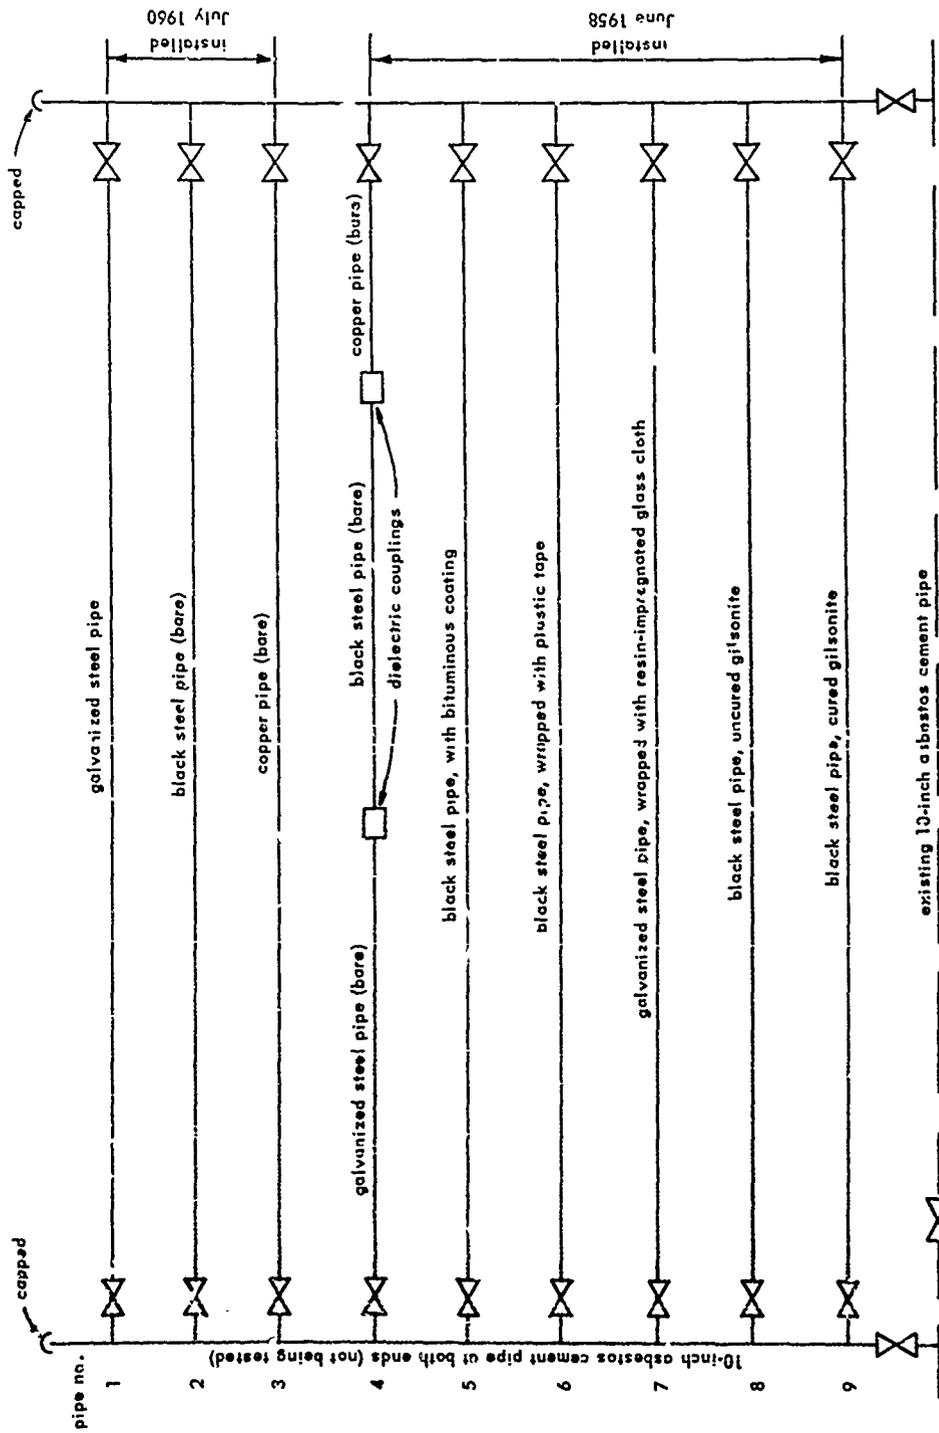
Diagram of underground pipe installation. Pipes spaced 4 feet apart and buried 3 feet.
